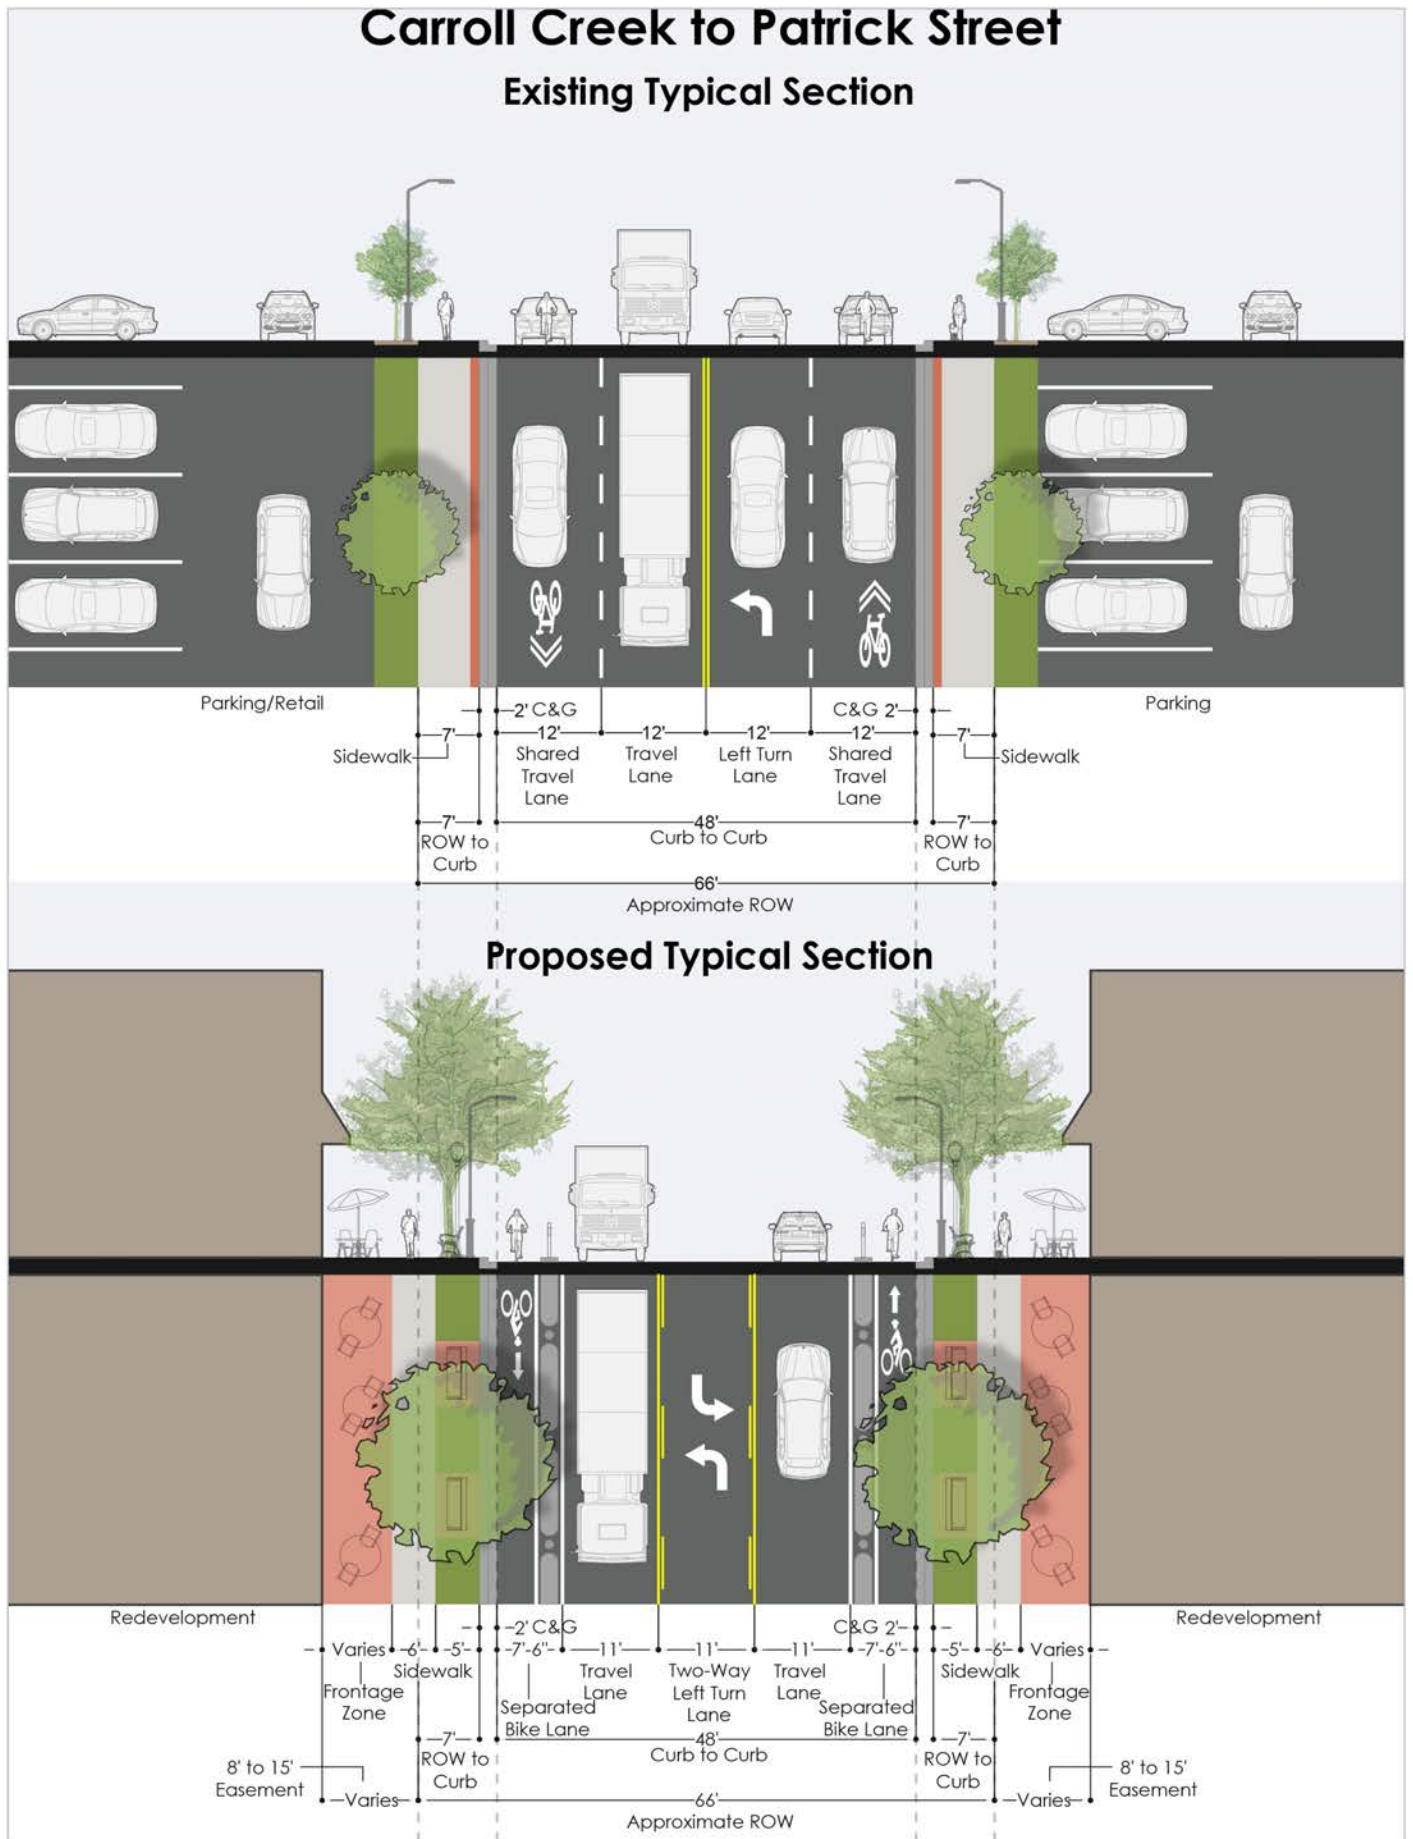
Existing and Proposed Typical Section - Carroll Creek to Patrick Street
